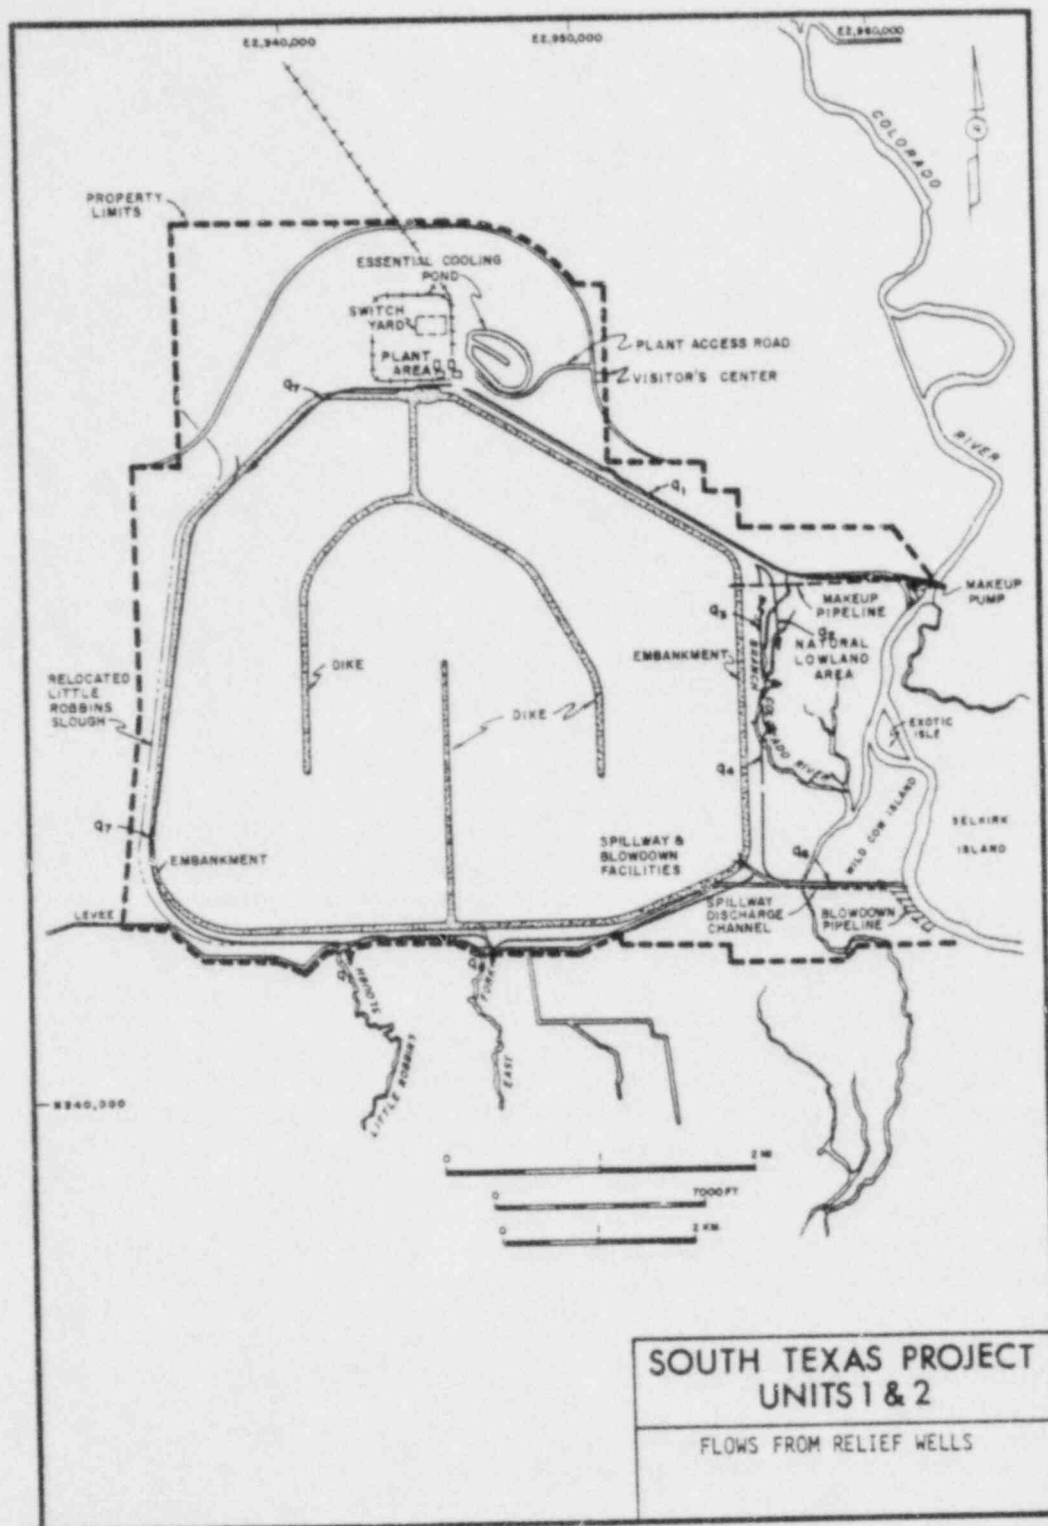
STP Plant Area (Source: Houston Power and Light 1978)
